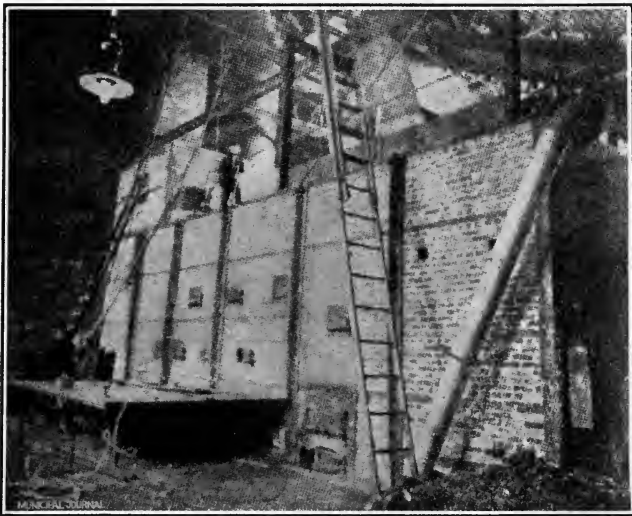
DESTRUCTOR AND STEAM BOILER, BUFFALO.
